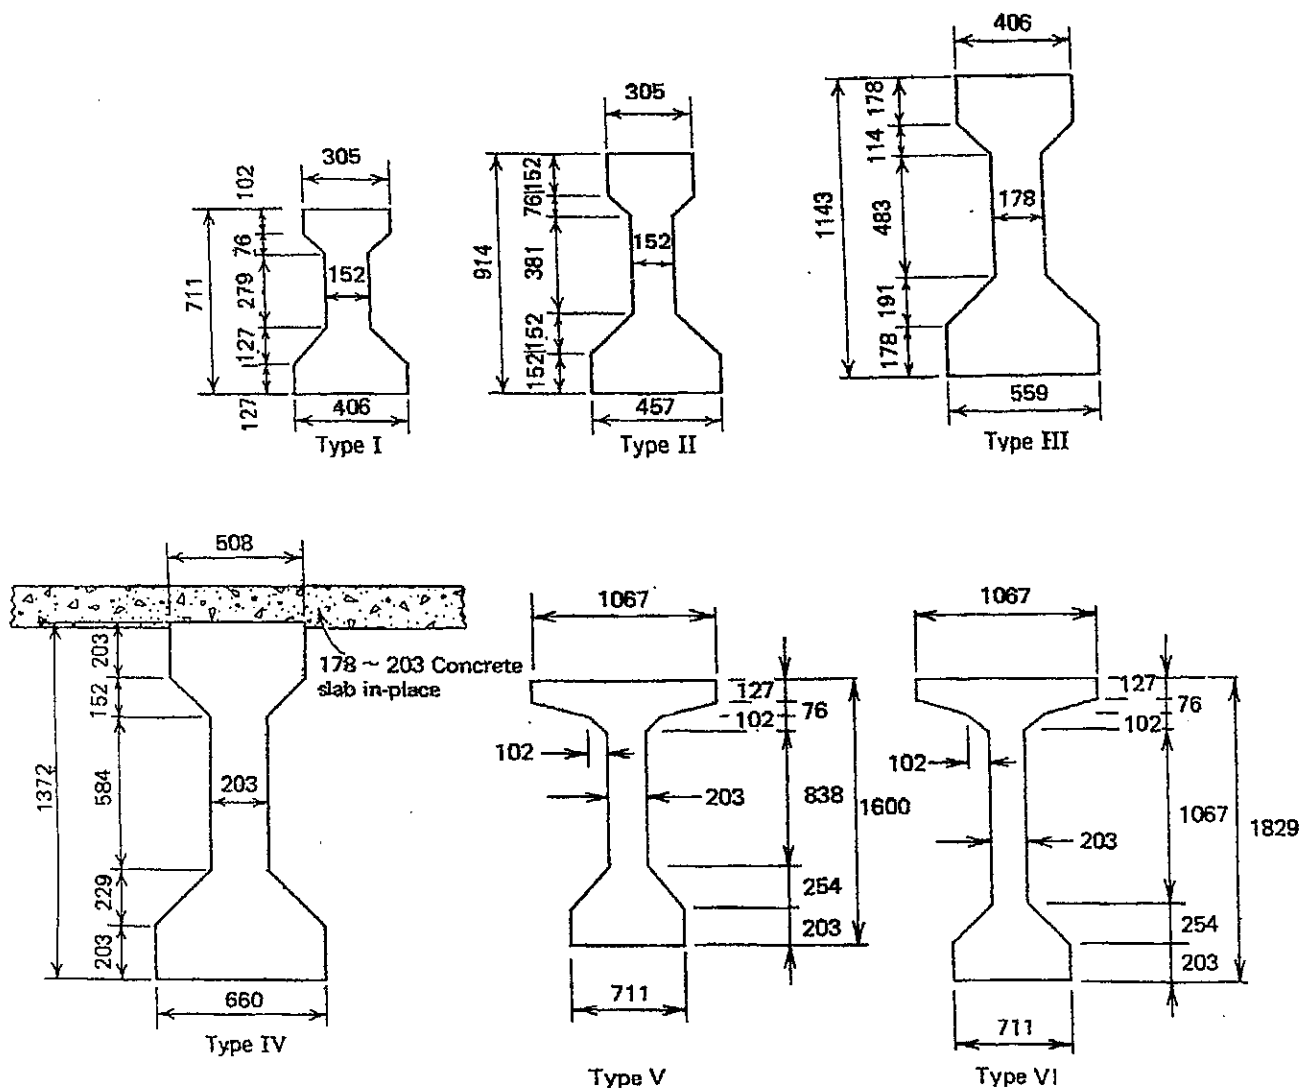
(d). Standard AASHTO-PCI prestressed concrete I-beams for highway bridges.²
